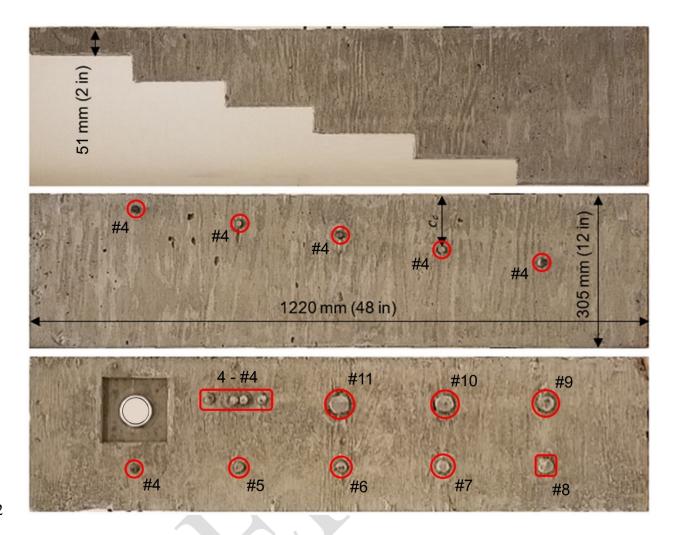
Photos (rectified elevations views) of three reference specimens (top to bottom):
